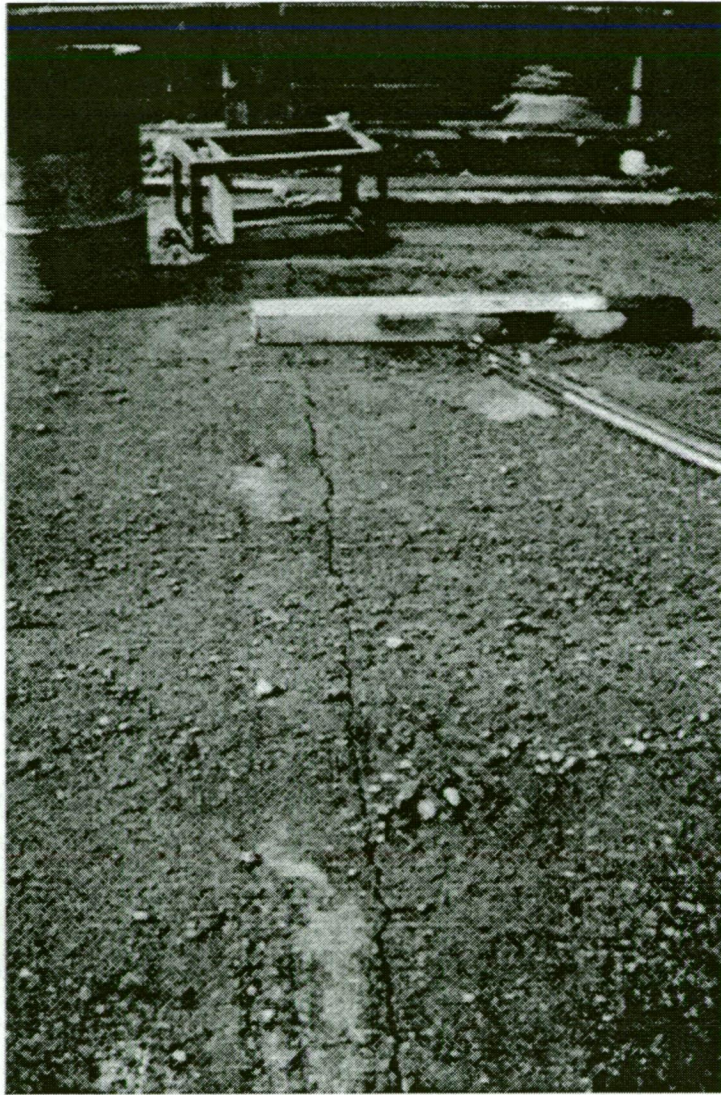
Cracking of Deck Surfacing over Pier at Ultimate Load
